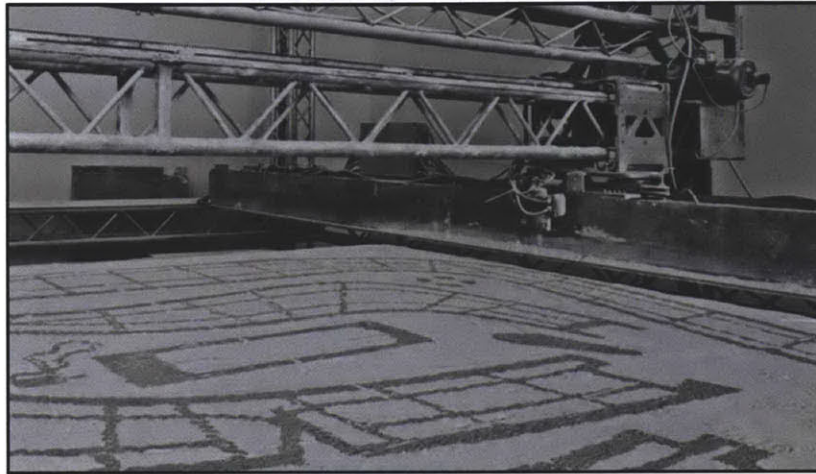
The D.Shape process deposits a liquid binder on successive layers of a powdered stone material to create large structures, similar to the printing technique used by Z Corporation powder printers. Image source: D.Shape
